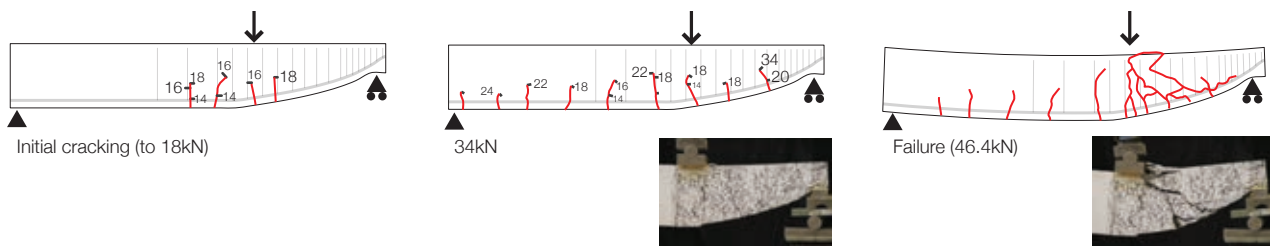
Progression of cracking in Beam 9\_2\_CFP\_M(i) and failure photographs.
